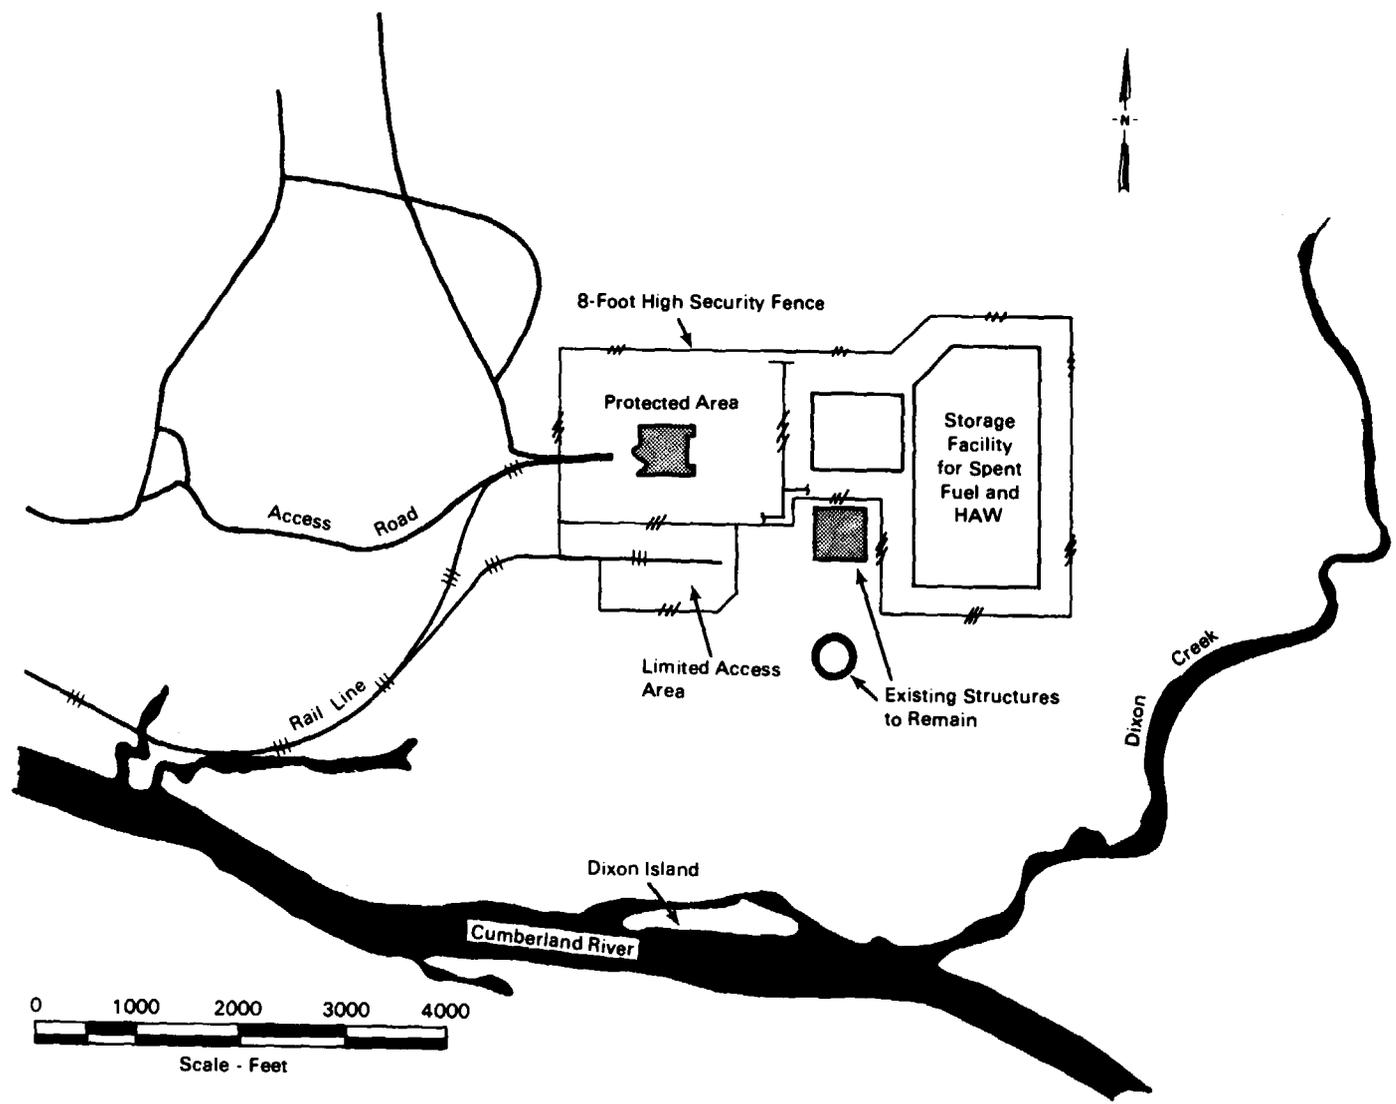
Layout of the Hartsville Site - Field Drywell Design
